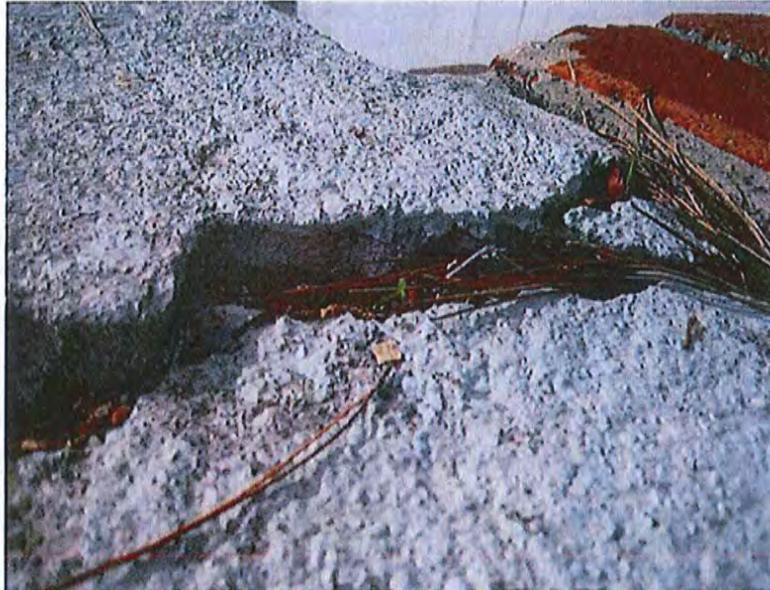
Paint visible in crack in top of poured-in-place concrete planter wall
